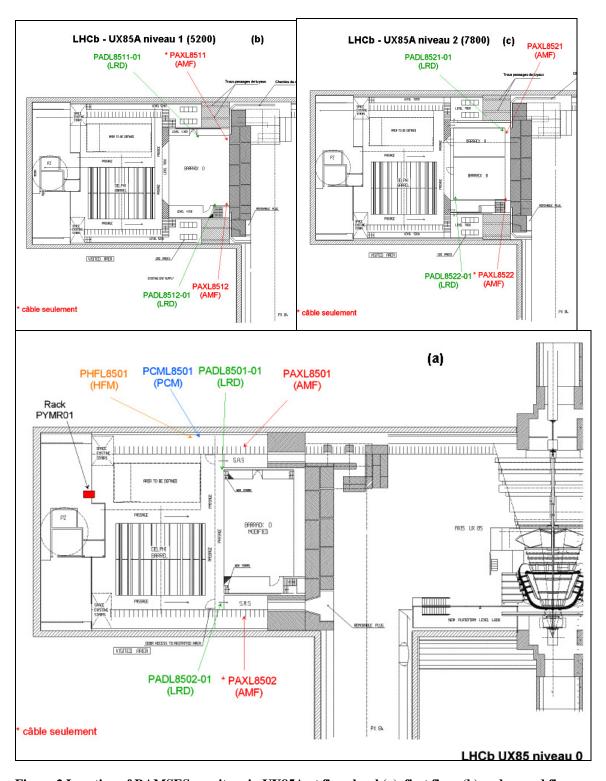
Location of RAMSES monitors in UX85A at floor level (a), first floor (b) and second floor (c)
